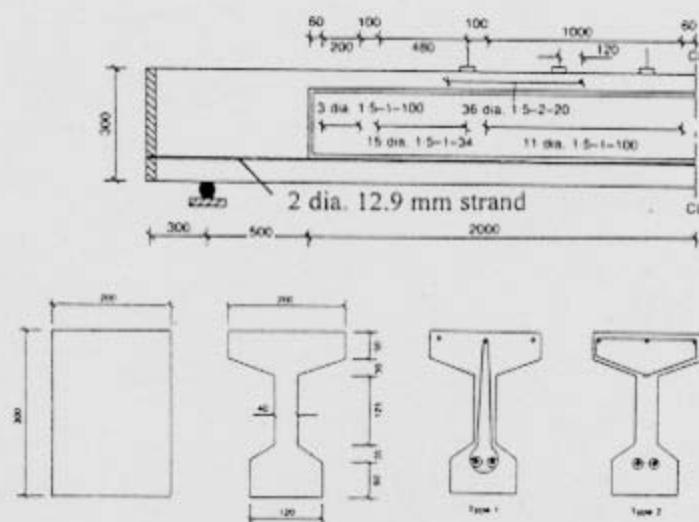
Case study 3. Dimensions and reinforcement detailing
